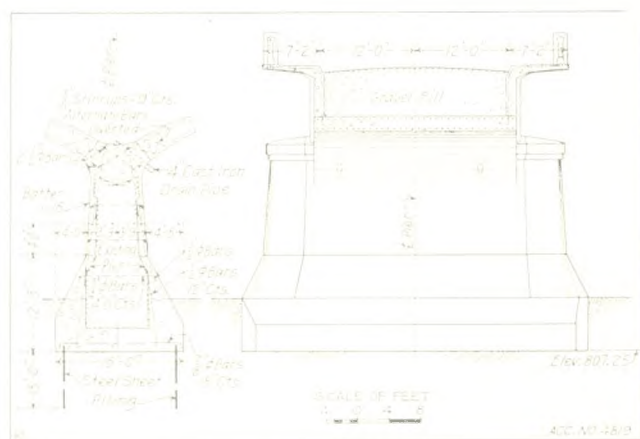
SKETCH ILLUSTRATING THE ENLARGEMENT OF THE BRIDGE PIERS ON THE ADAMS STREET BRIDGE, TROY.
